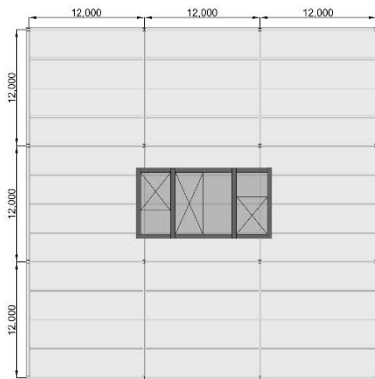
Building archetypes used in study, representative of typical mid-rise building buildings in the City of Westminster.
